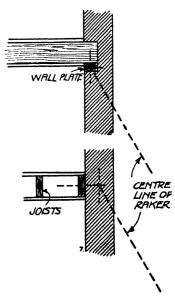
How the centre line of rakers should be arranged according to how the floor is constructed
